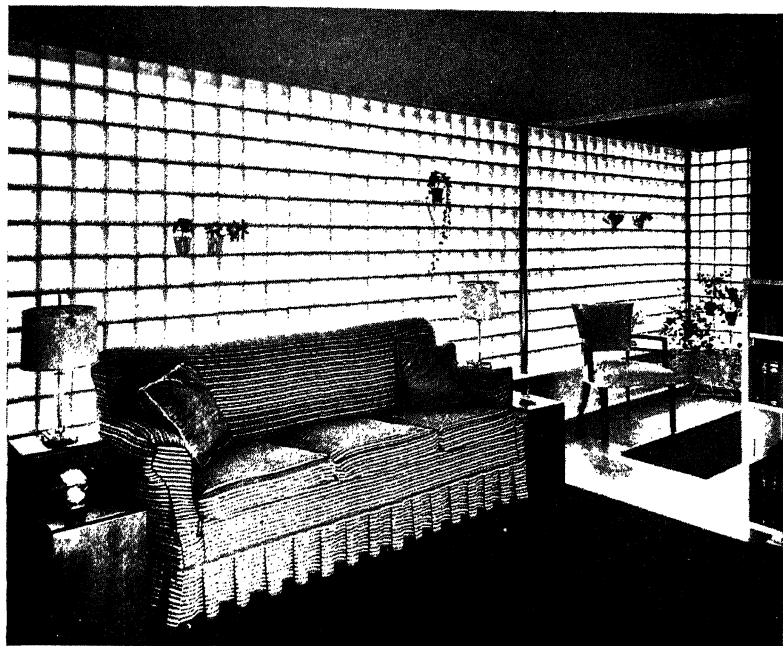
The living room of the house shown in Fig. 41. A wall of glass brick shuts out noise from the street.
